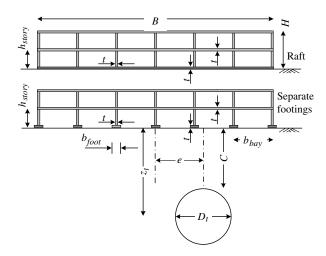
Experimental layout for different tunnel-frame configurations. F2:1
